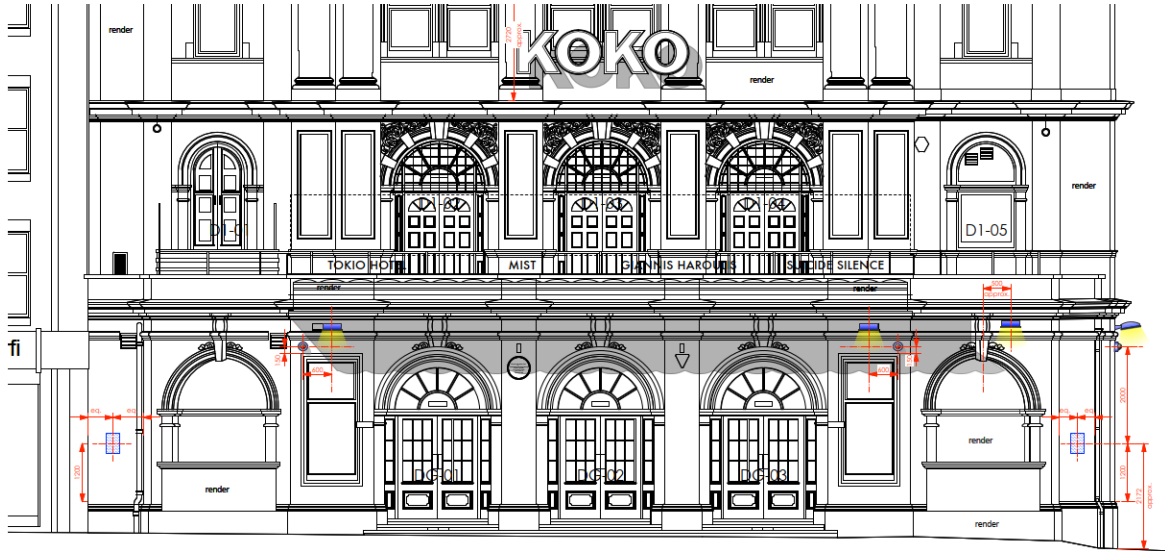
Screenshot taken from drawing ref. AHA/KKR/PL/201-1CCTV – Side Elevation (Crowndale Road)
